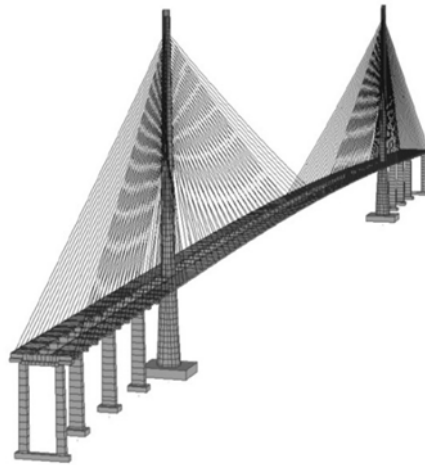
Example of Numerical Model of Undamaged Cable-Stayed Bridge [153]
